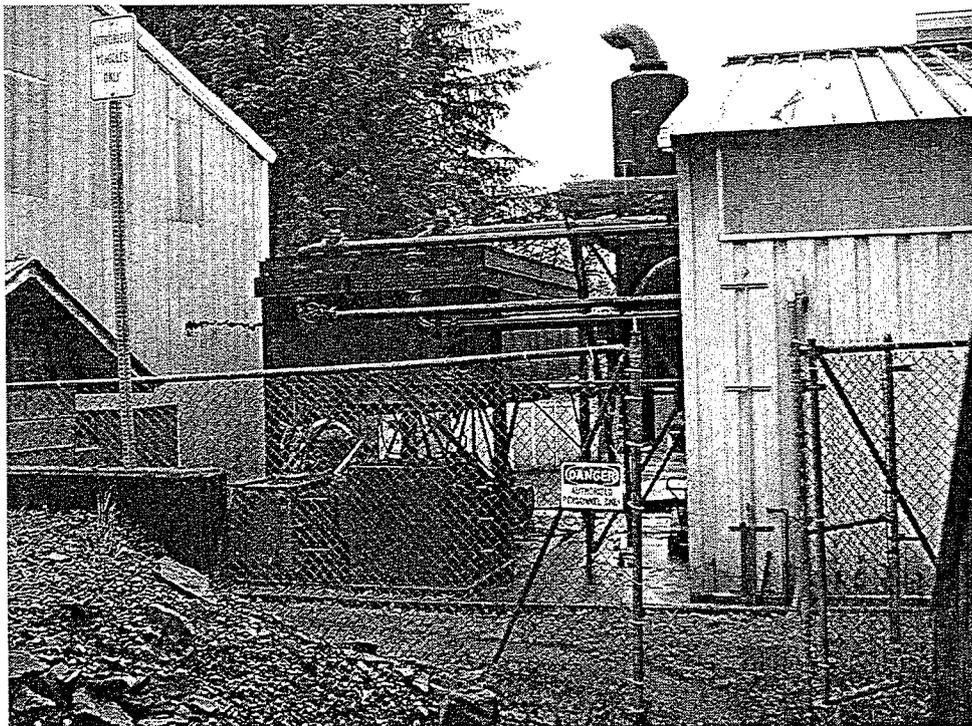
EXISTING POWER PLANT SITE; RADIATORS AND EXHAUST
